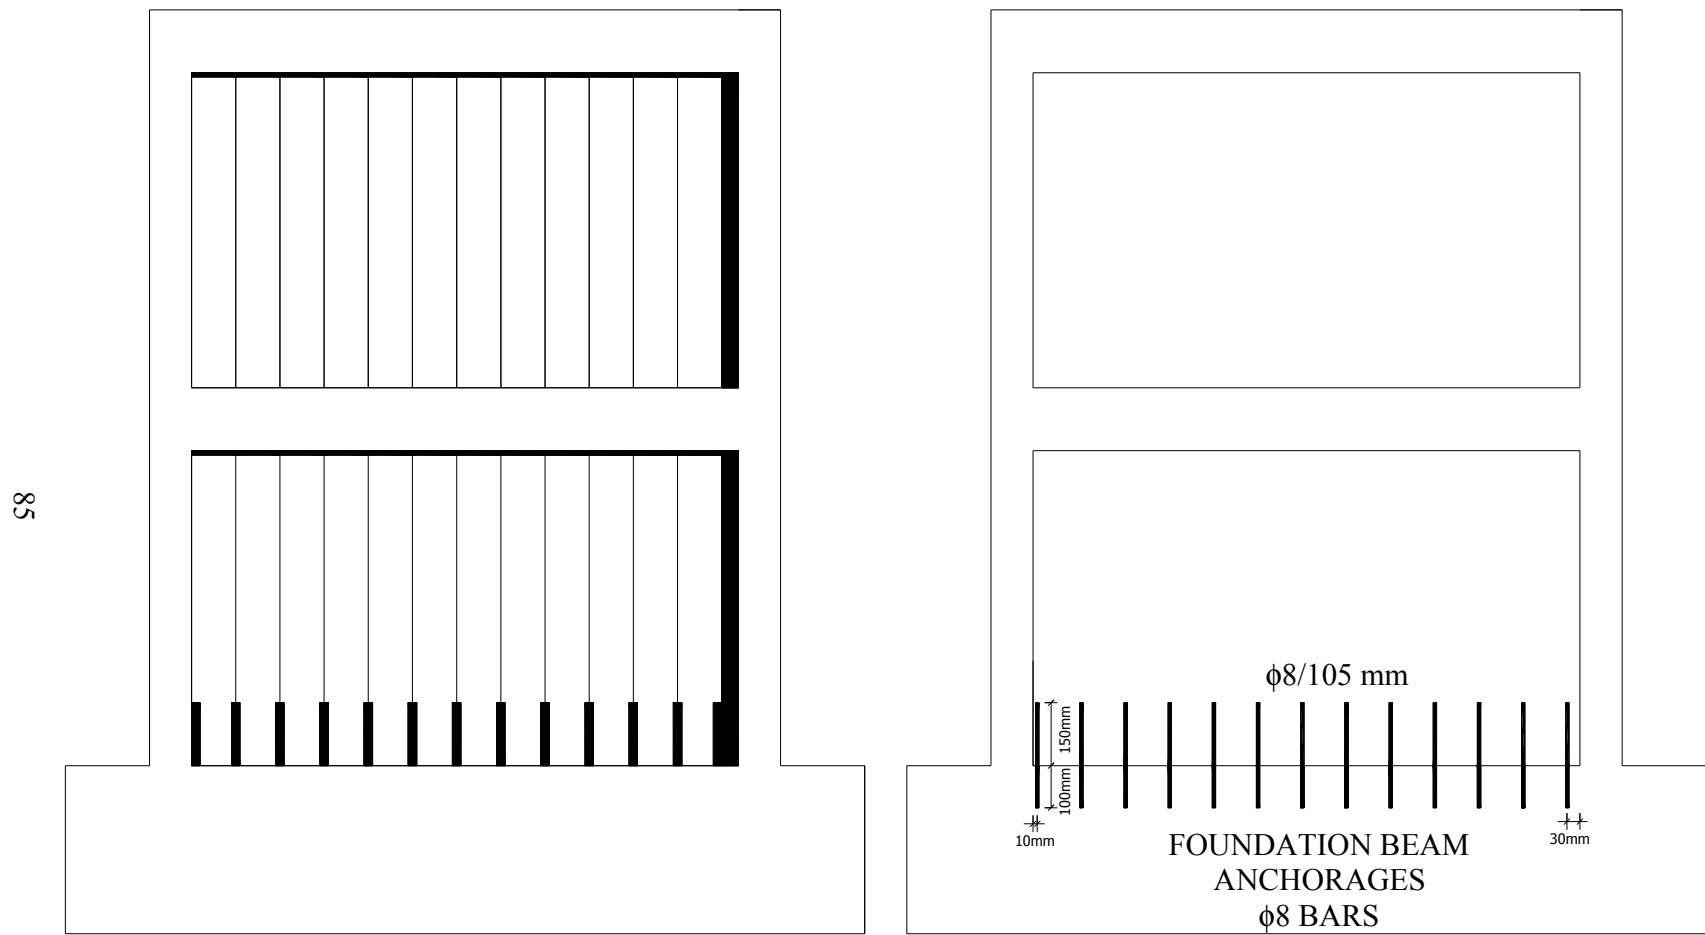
Panel arrangement and configuration of the dowels for Specimen CID1 and LID1
